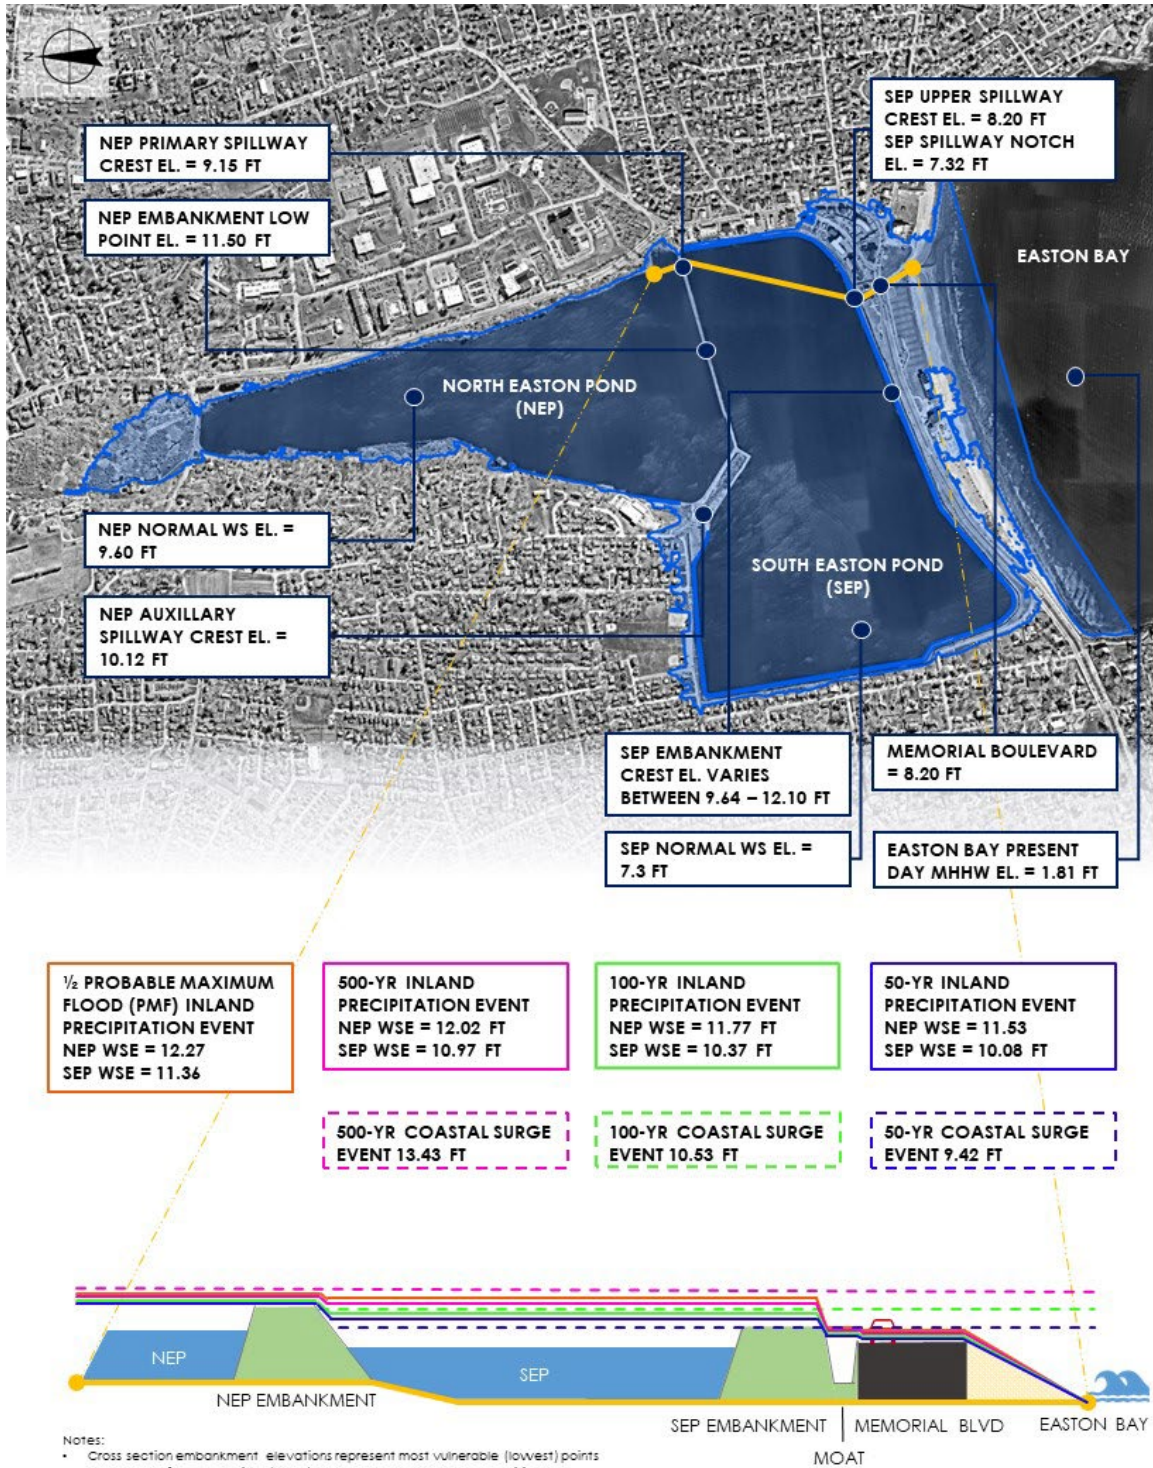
Peak Water Surface Elevation Plan & Profile View for Existing Conditions (Present-Day)
